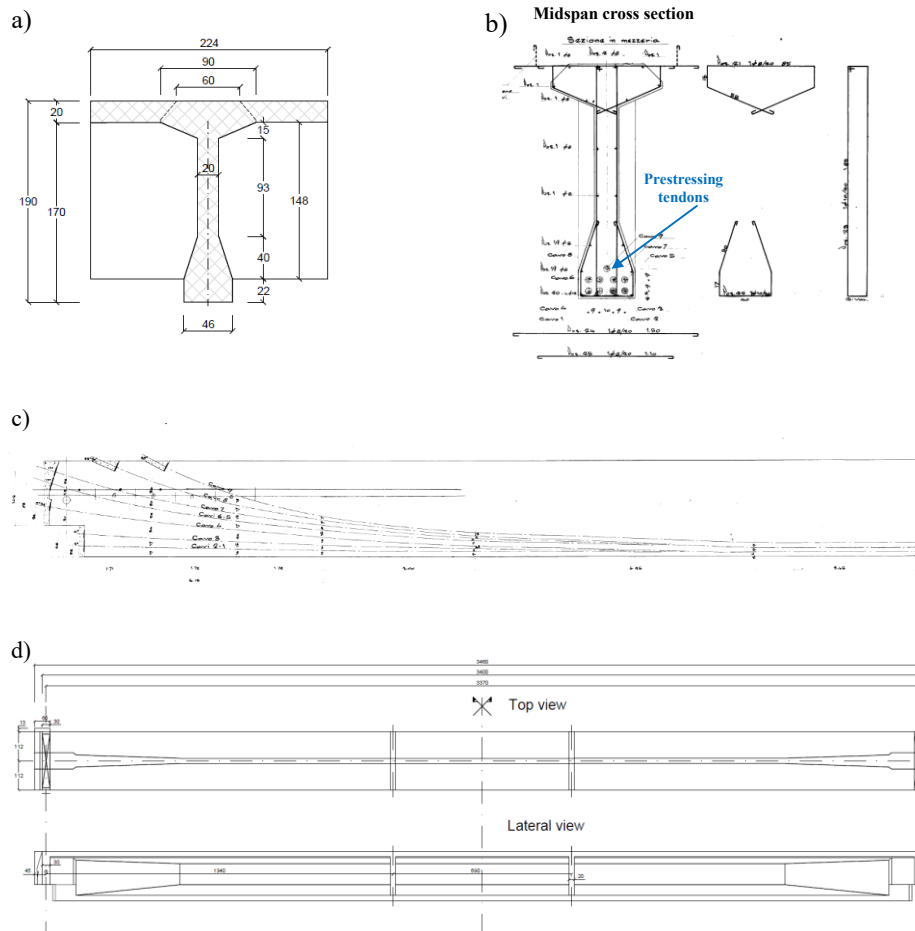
Cross-sectional perspective at the midpoint of the precast concrete beam and the upper slab (a), along with the associated reinforcement arrangement and placement of the prestressing tendons (b), and the arrangement of the prestressing tendons in the longitudinal direction (c). The longitudinal structure of the beam is illustrated in (d). All measurements are in centimeters.
